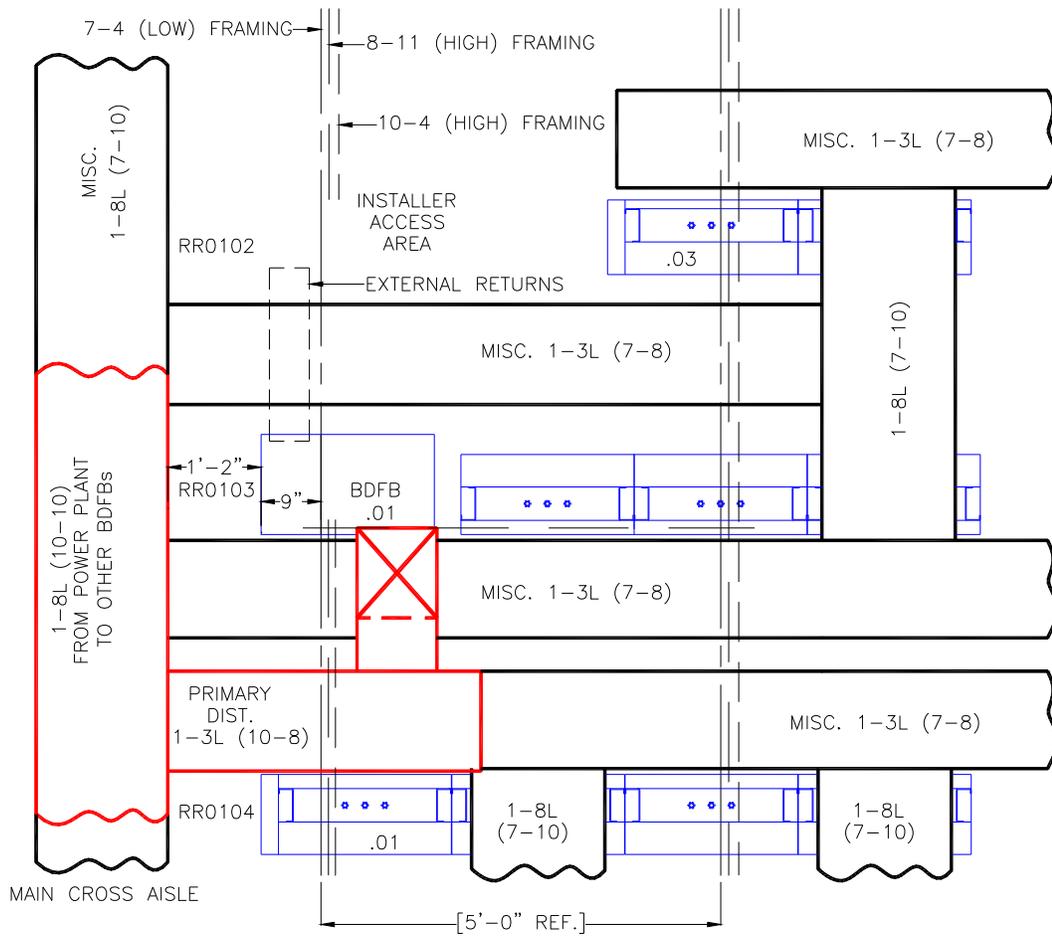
B – TYPICAL PLAN VIEW OF NEW AREA WITH 2-TIERED CABLE RACKING
